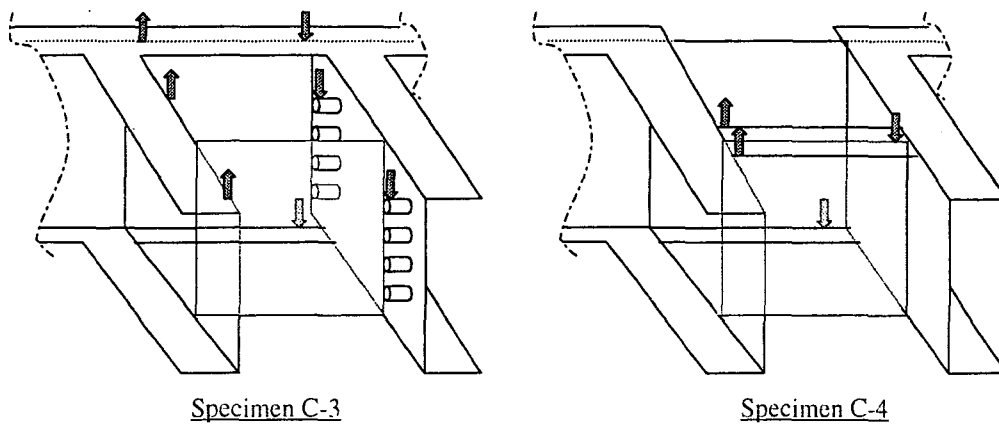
Difference between the paths of force transfer from pier to connection in specimen C-3 and C-4
